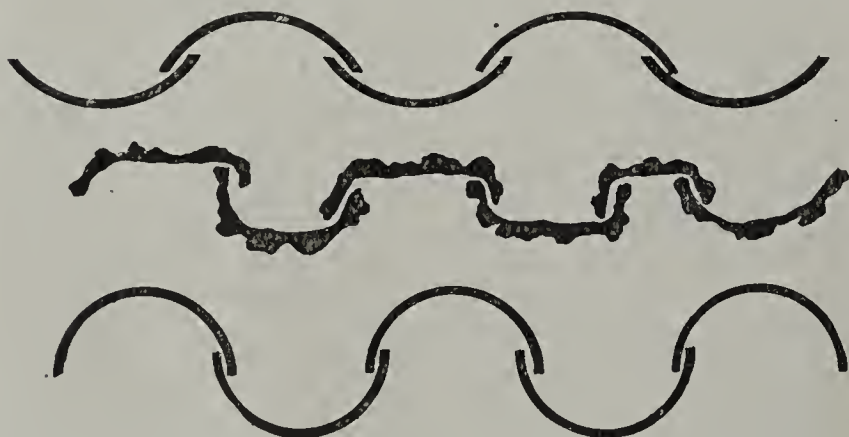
Normal Tiles and Bark Used as Original Roofing Tile.
